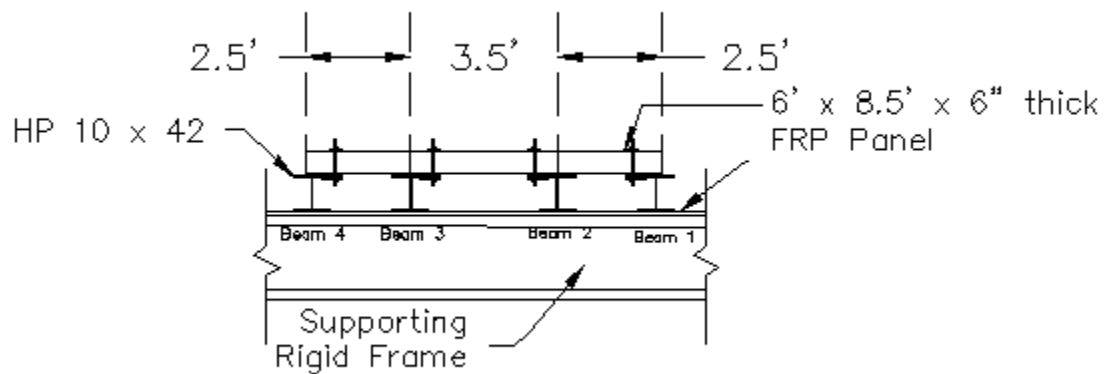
Cross Section of Continuous Panel Test - View Toward East
